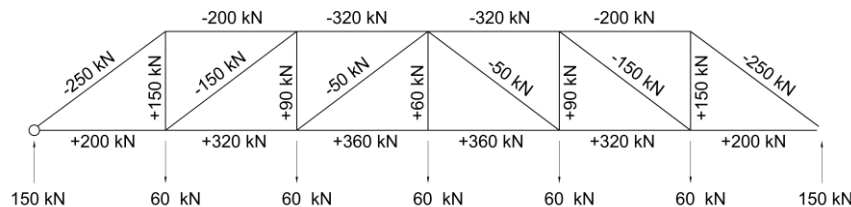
Summary diagram showing the solved member forces in the truss bridge
